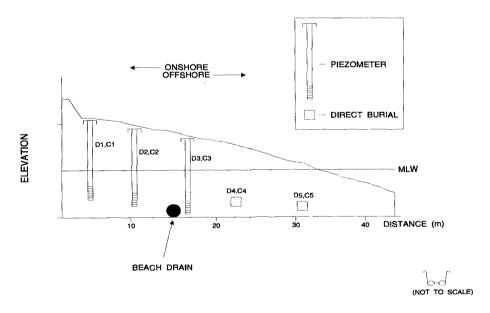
Cross-sectional schematic of the groundwater monitoring installation at Codfish Park STABEACH segment and adjacent control beach.
